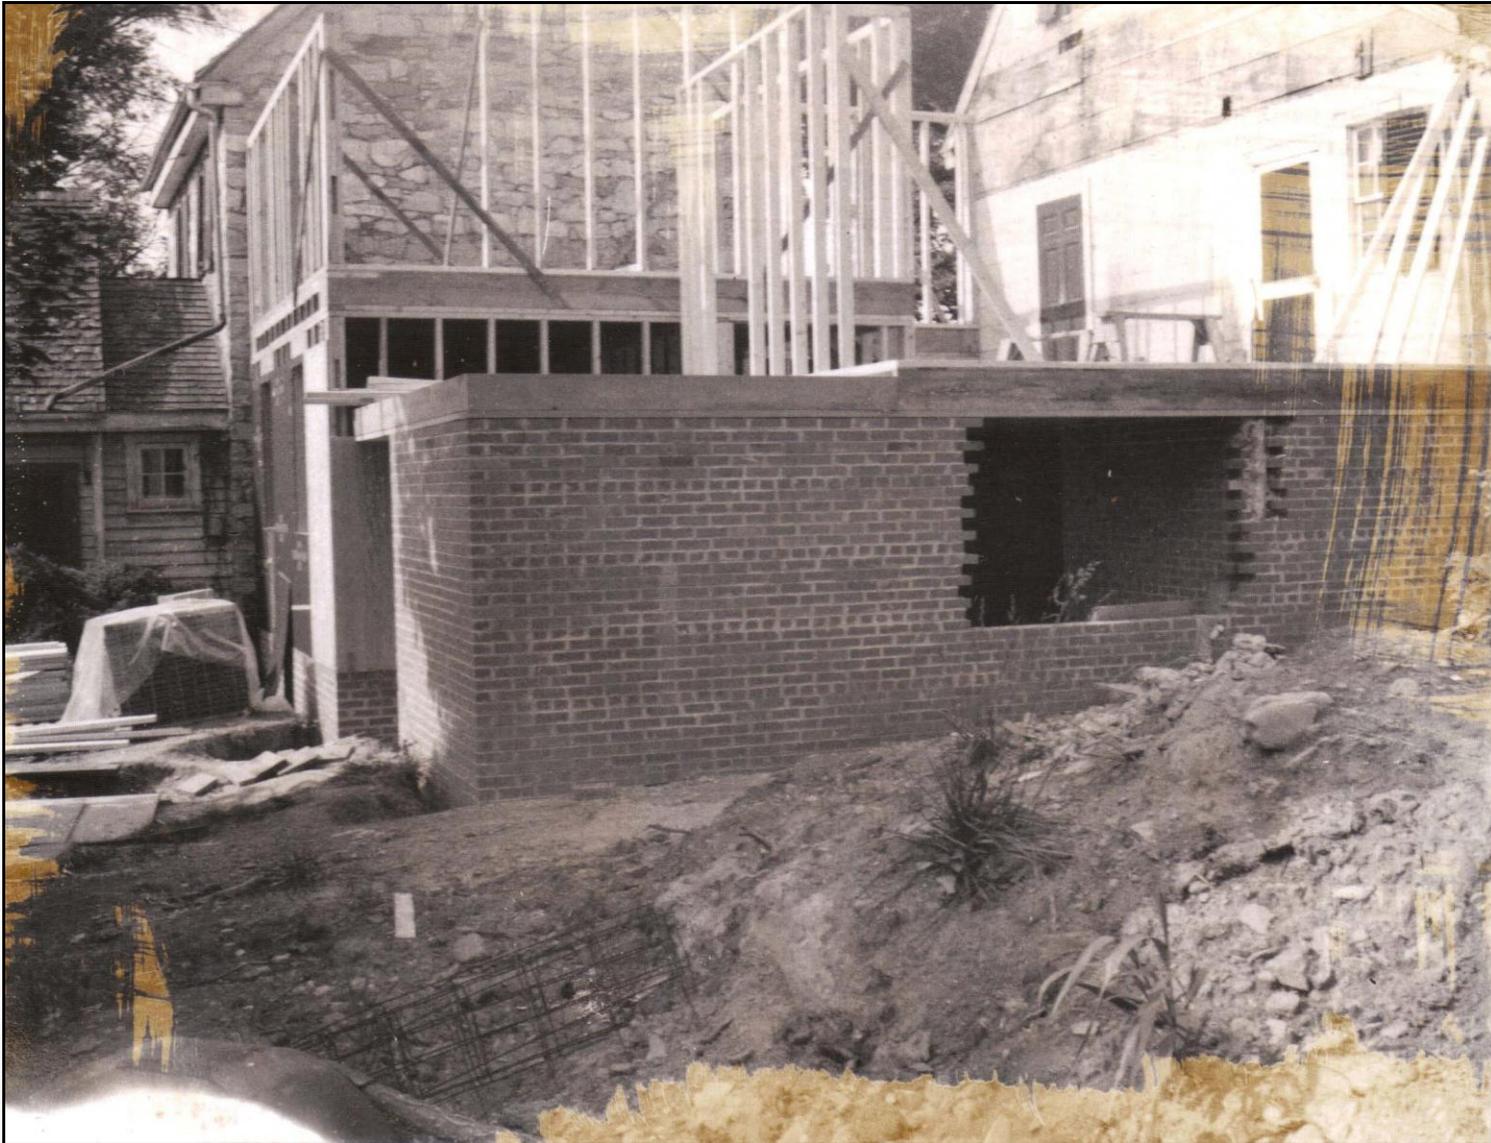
1970 showing construction of frame wing connecting west frame and stone section.
